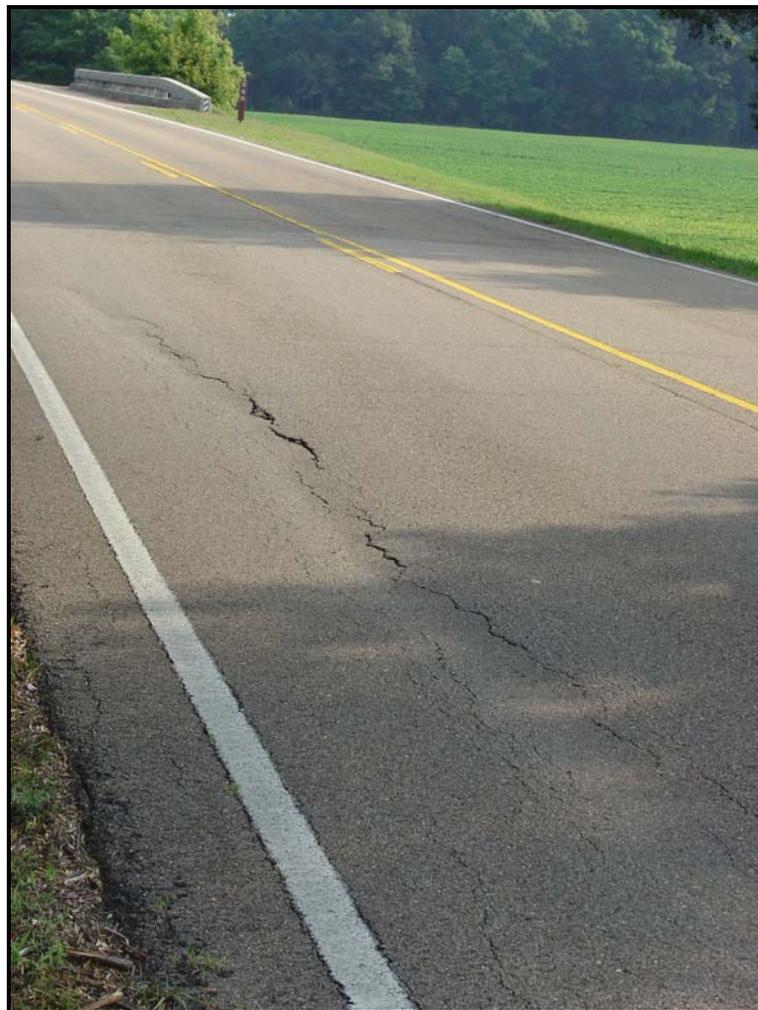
High Severity Fatigue Cracks on Wheel Path
